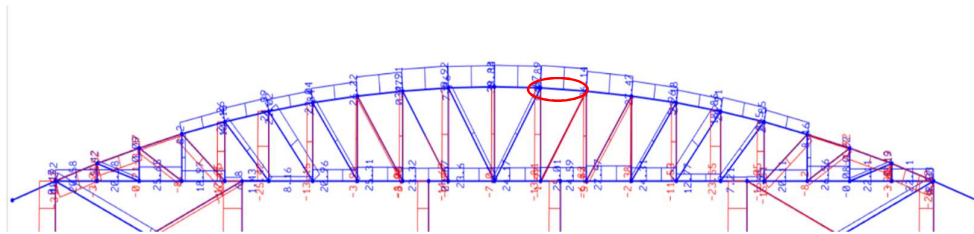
Element in tension to be designed on the reticular steel roof.
